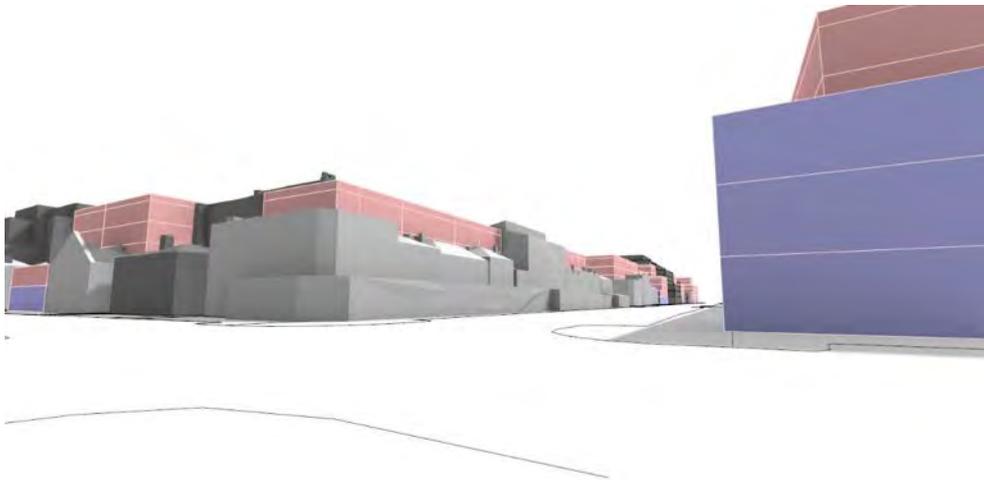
View 9: Southeast corner of Dorcas Street and Clarendon Street, looking north along the western side of Clarendon Street. (HO440) western side of Clarendon Street:
